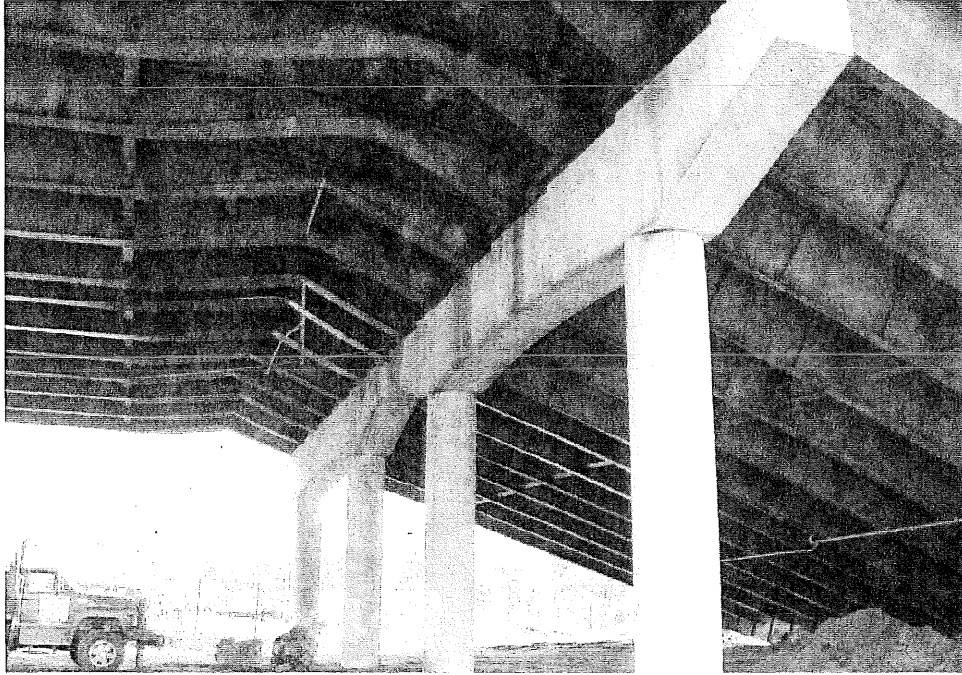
Plastic hinging in steel girders south of Pier 4, looking west.
